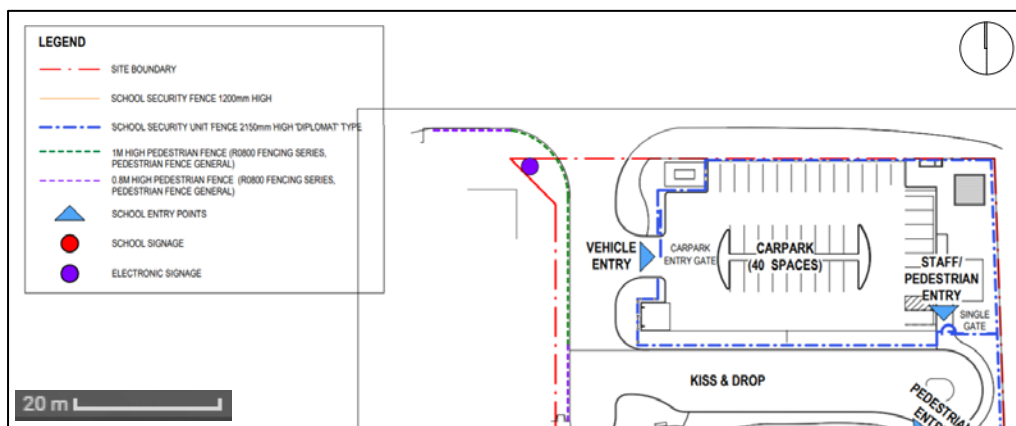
| Fencing at Fairley Street entry (Source: Applicant's RtS 2021)
